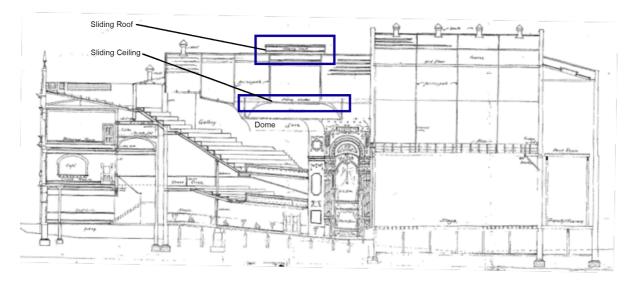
Longitudinal Section of the original plans for the Opera House, showing the sliding roof and ceiling system (Pitt, 1913)
